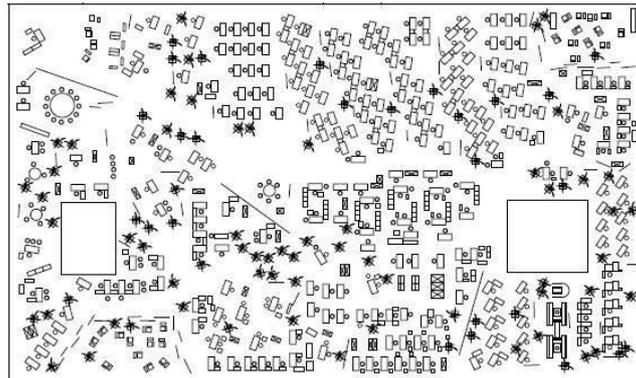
A floor plan showing a Burolandschaft style layout of office furniture. (Collyer, 2019)
